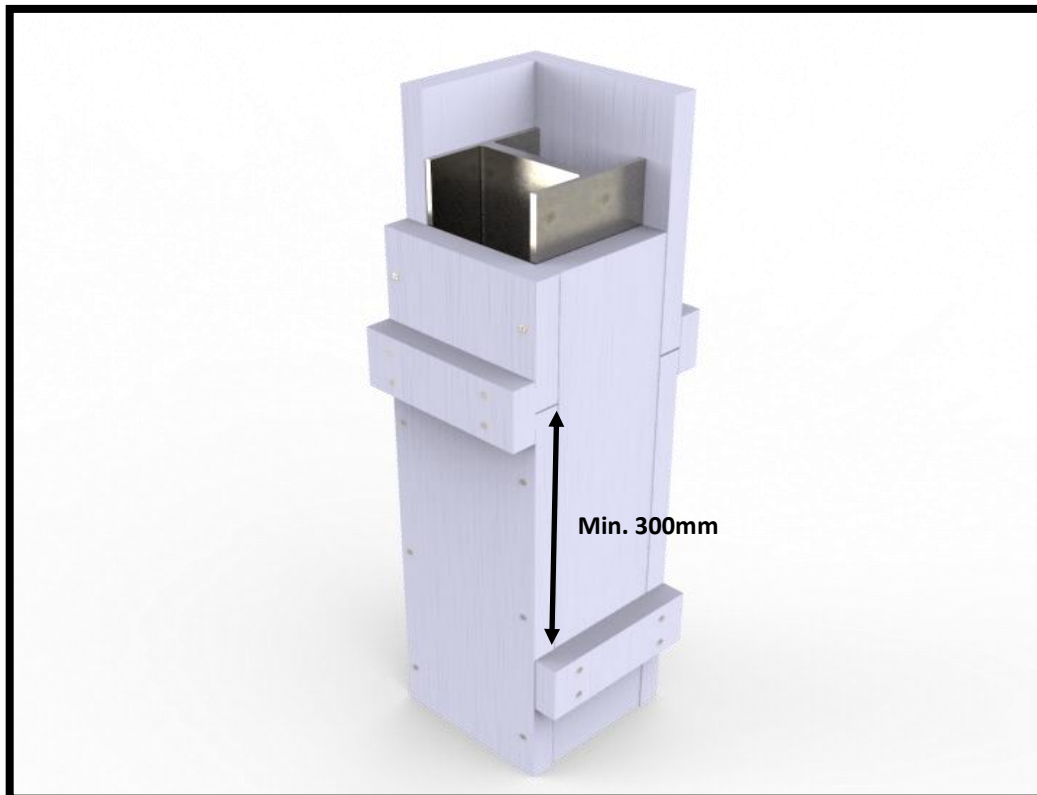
Column Encasement Showing Cover strips and Board Joint Stagger
